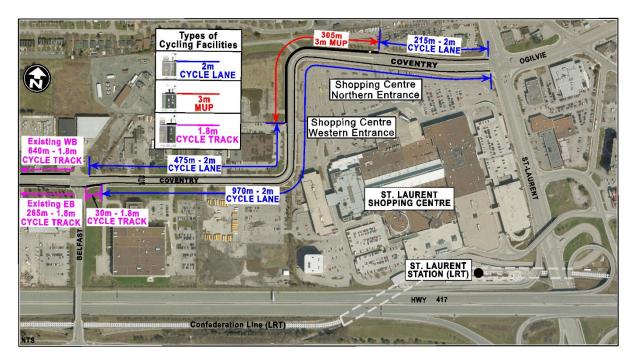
Pedestrian and Cycling Facilities along Coventry Road (Belfast Road - St. Laurent Boulevard section)
